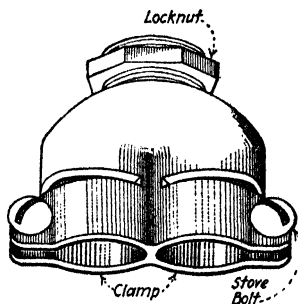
Duplex "squeeze" type box connectors. (The M. B. Austin Co., Chicago, Ill.)
